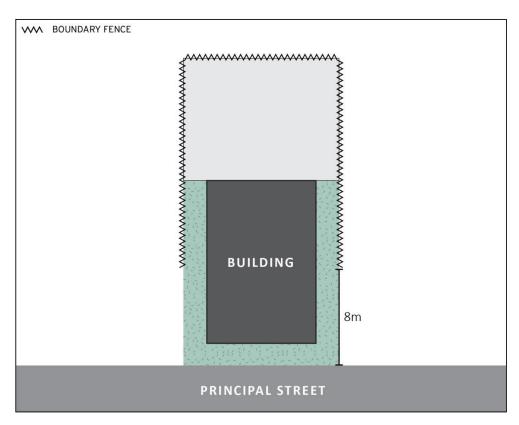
Construction of a new timber paling fence, which is visible from a street, is exempt if located in this area
